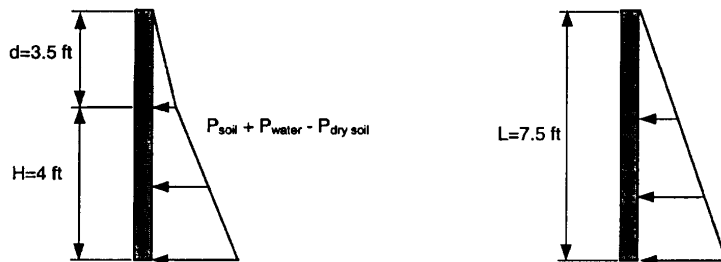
Actual and assumed pressure acting on a retaining wall.
